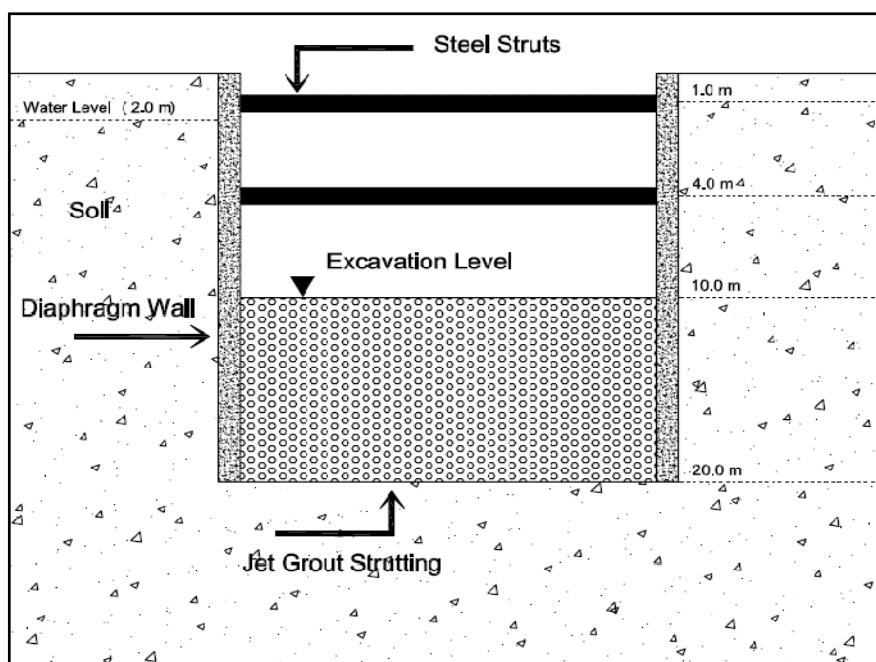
1 Schematic cross section view of the excavation for cut and cover tunnel
